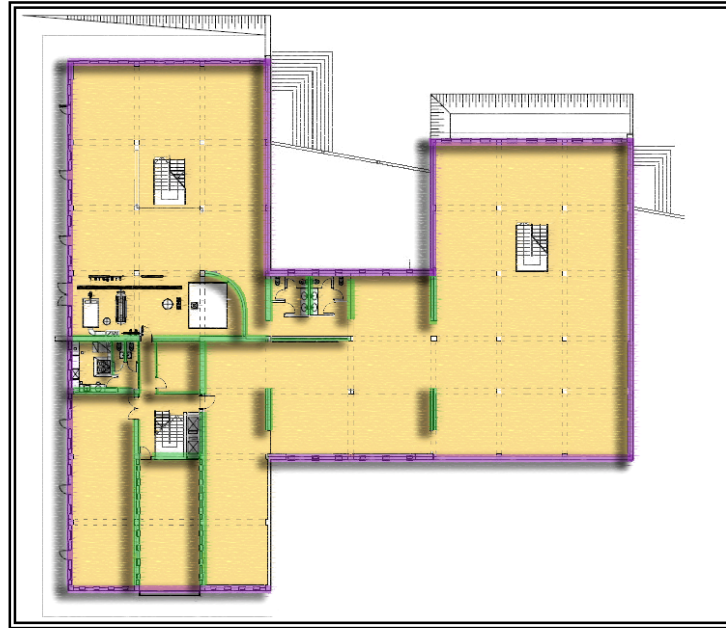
Adopted basement floor plan of METU Halıcı Software House.
